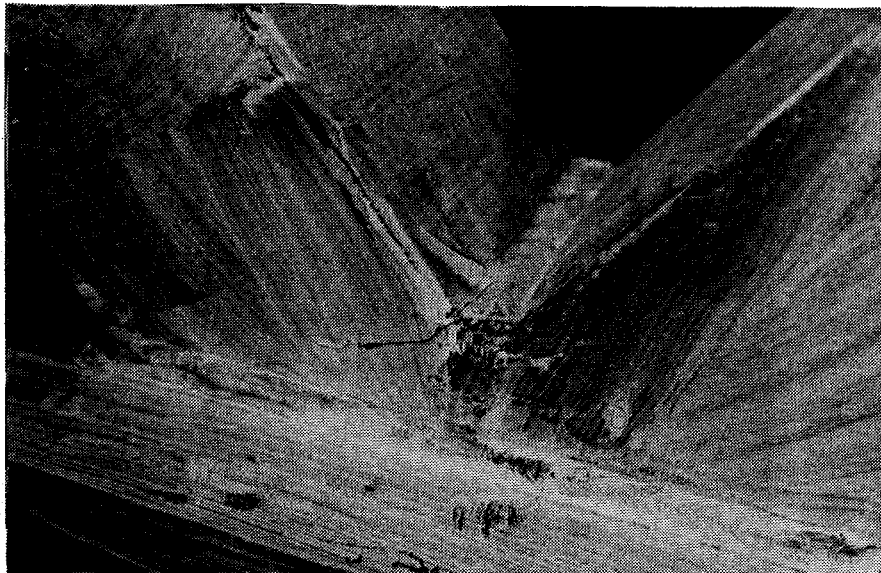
Fatigue Crack in Joint L1 (T2F)
